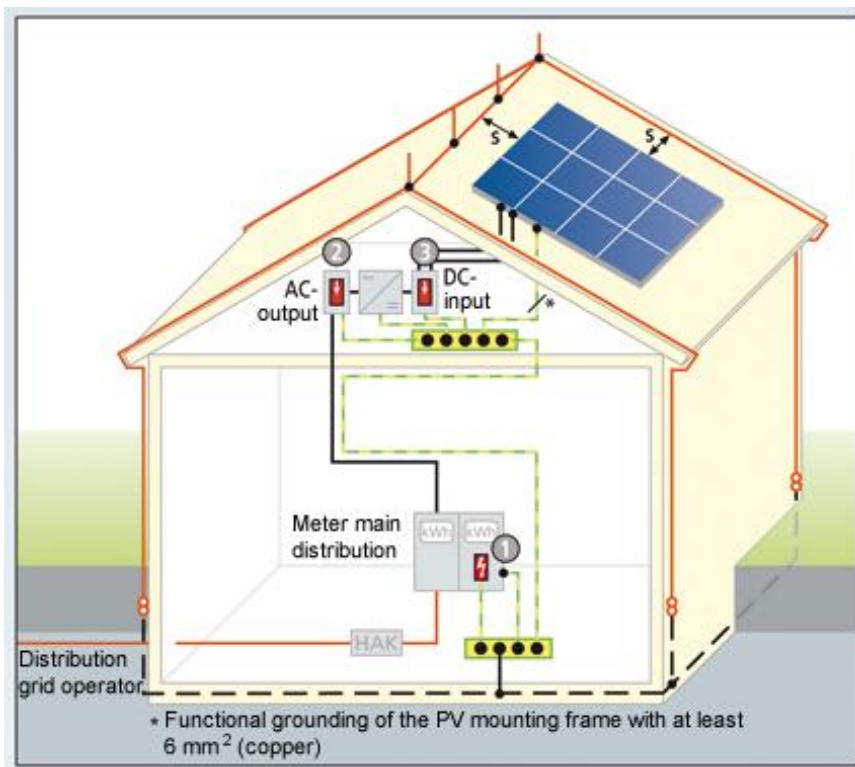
Surge protection concept for a PV system with external lightning protection with separation distance s ; source: Dehn, Blitzplaner [70]
